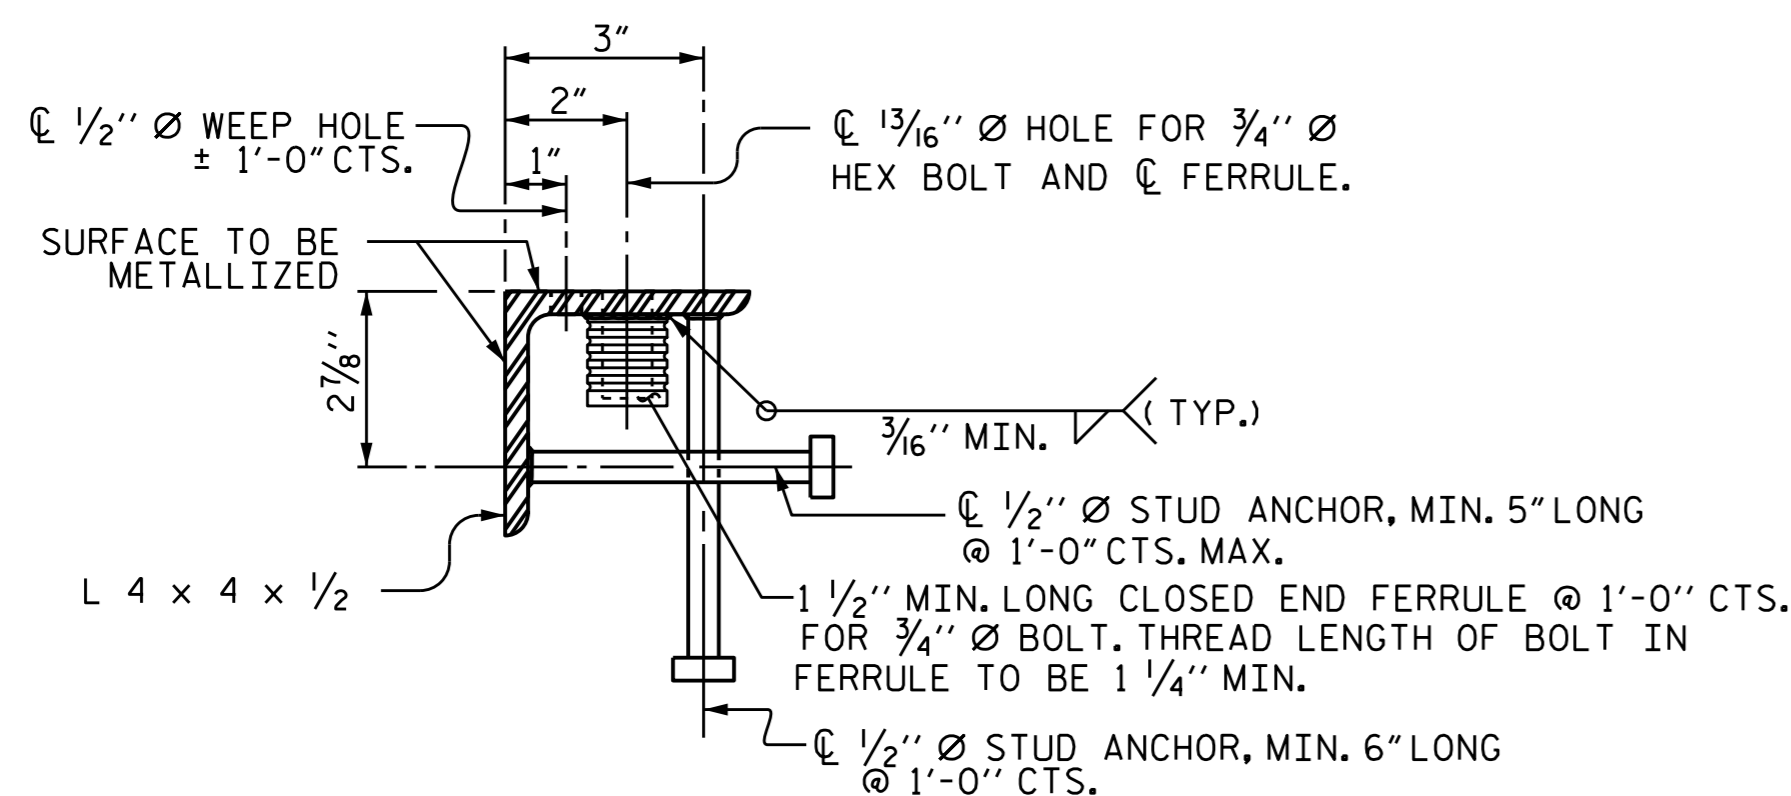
DETAIL - FIELD WELD SPLICE OF BASE ANGLE
